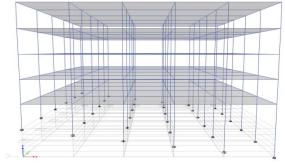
3D View of a Building on Sloping Ground (5bay 5storey).
